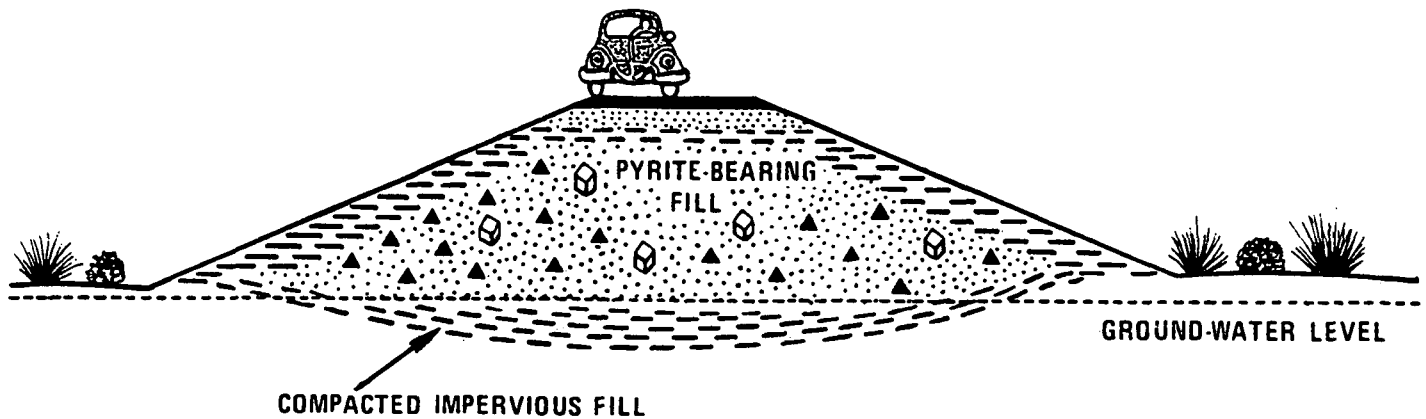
Impervious Fill Surrounding Roadfill Containing Pyrite Restricts Contact With Water and Air
